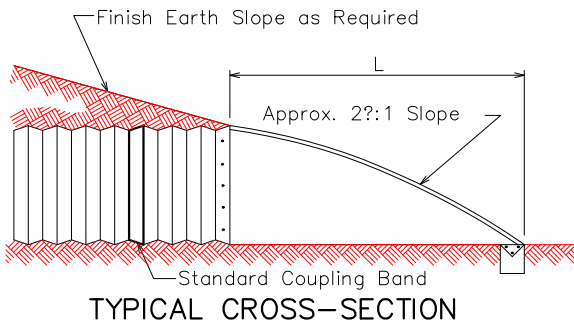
CULVERT-CMP FLARED ENDS-ARCH
